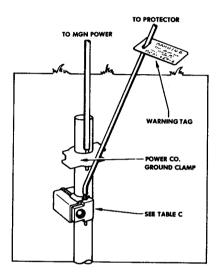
MGN Power Grounded to Ground Rod—No Water Pipe—Connection to Pipe Not Possible
